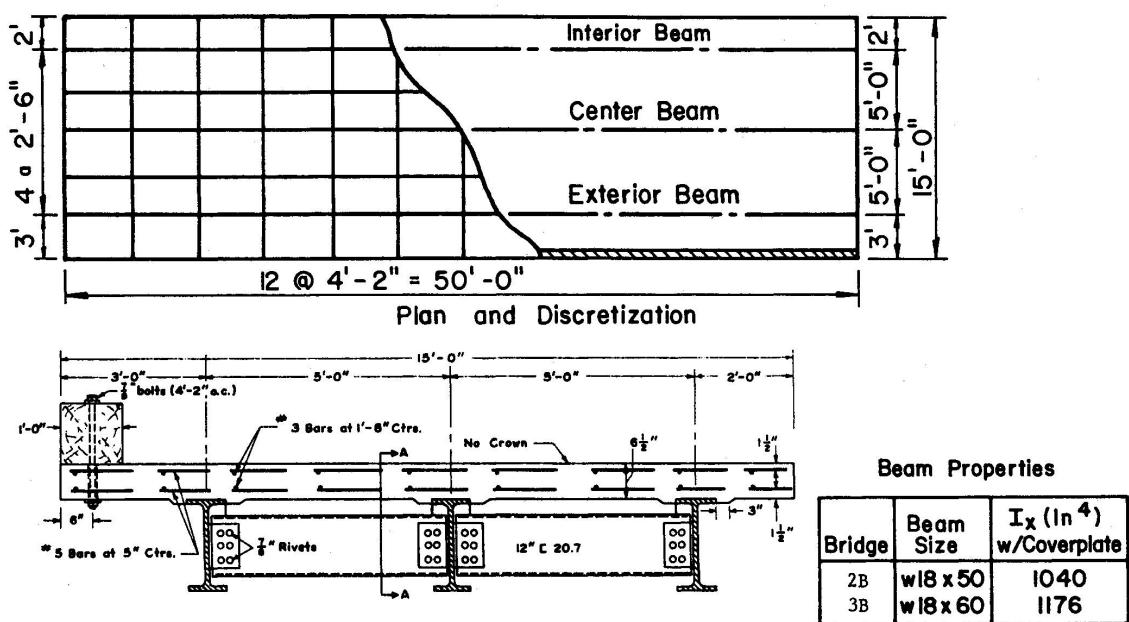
Test Bridge; Left Beam = Exterior Beam,
